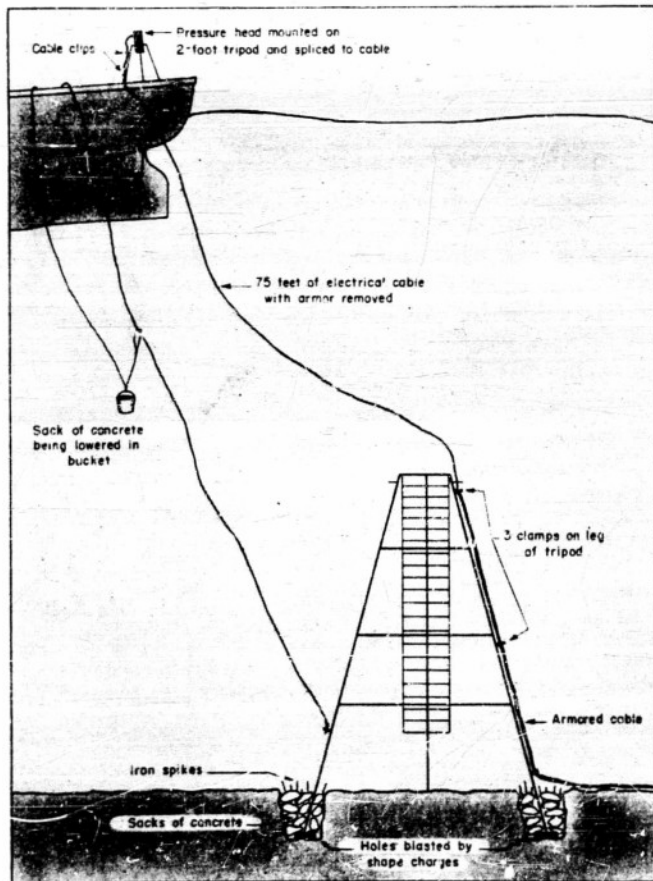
Diagram of instrument installation showing method of installing concrete and Mark IX wave pressure recorder
